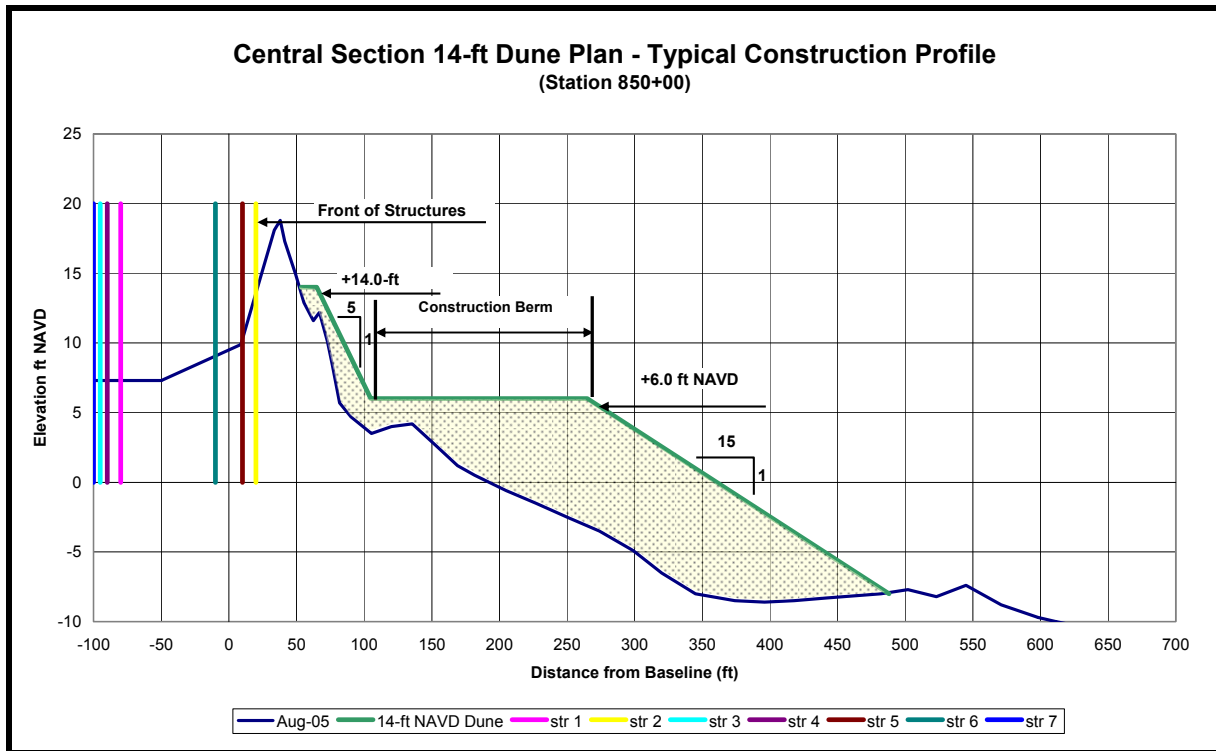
Typical construction profile, Central Section 14-foot Dune Plan (Station 850+00).
